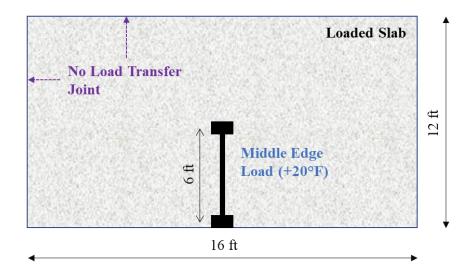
3-D finite-element model for analysis of jointed plain concrete pavement under critical loading condition
